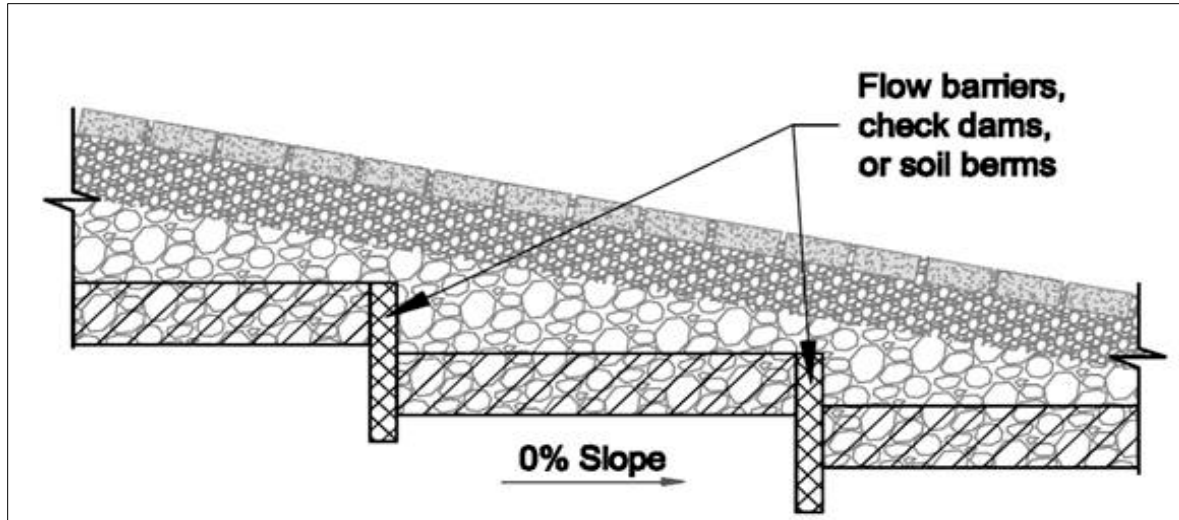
Use of flow barriers to encourage infiltration on sloped sites.
